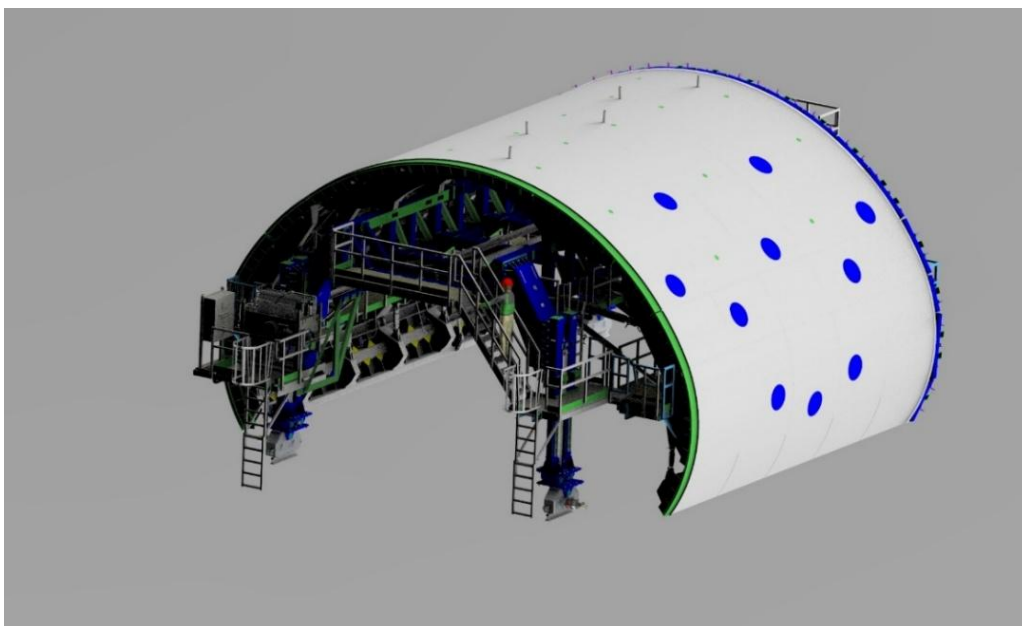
3D model of a steel hydraulic formwork for a double-track tunnel
